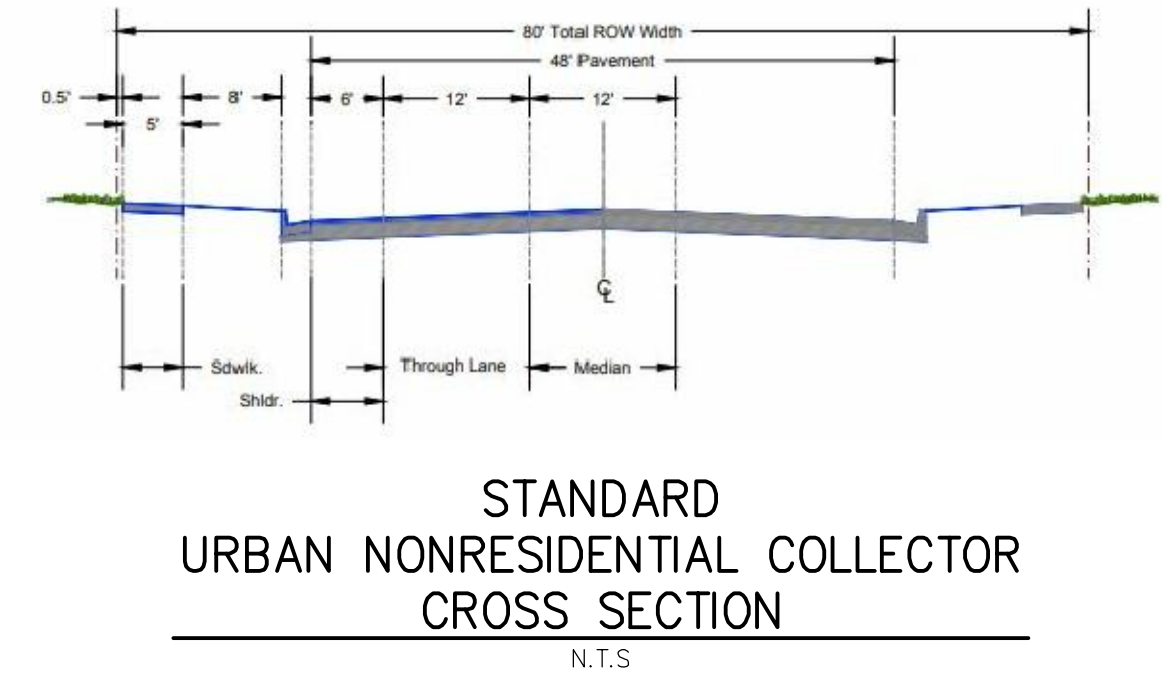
Typical Urban Nonresidential Collector Cross Section
